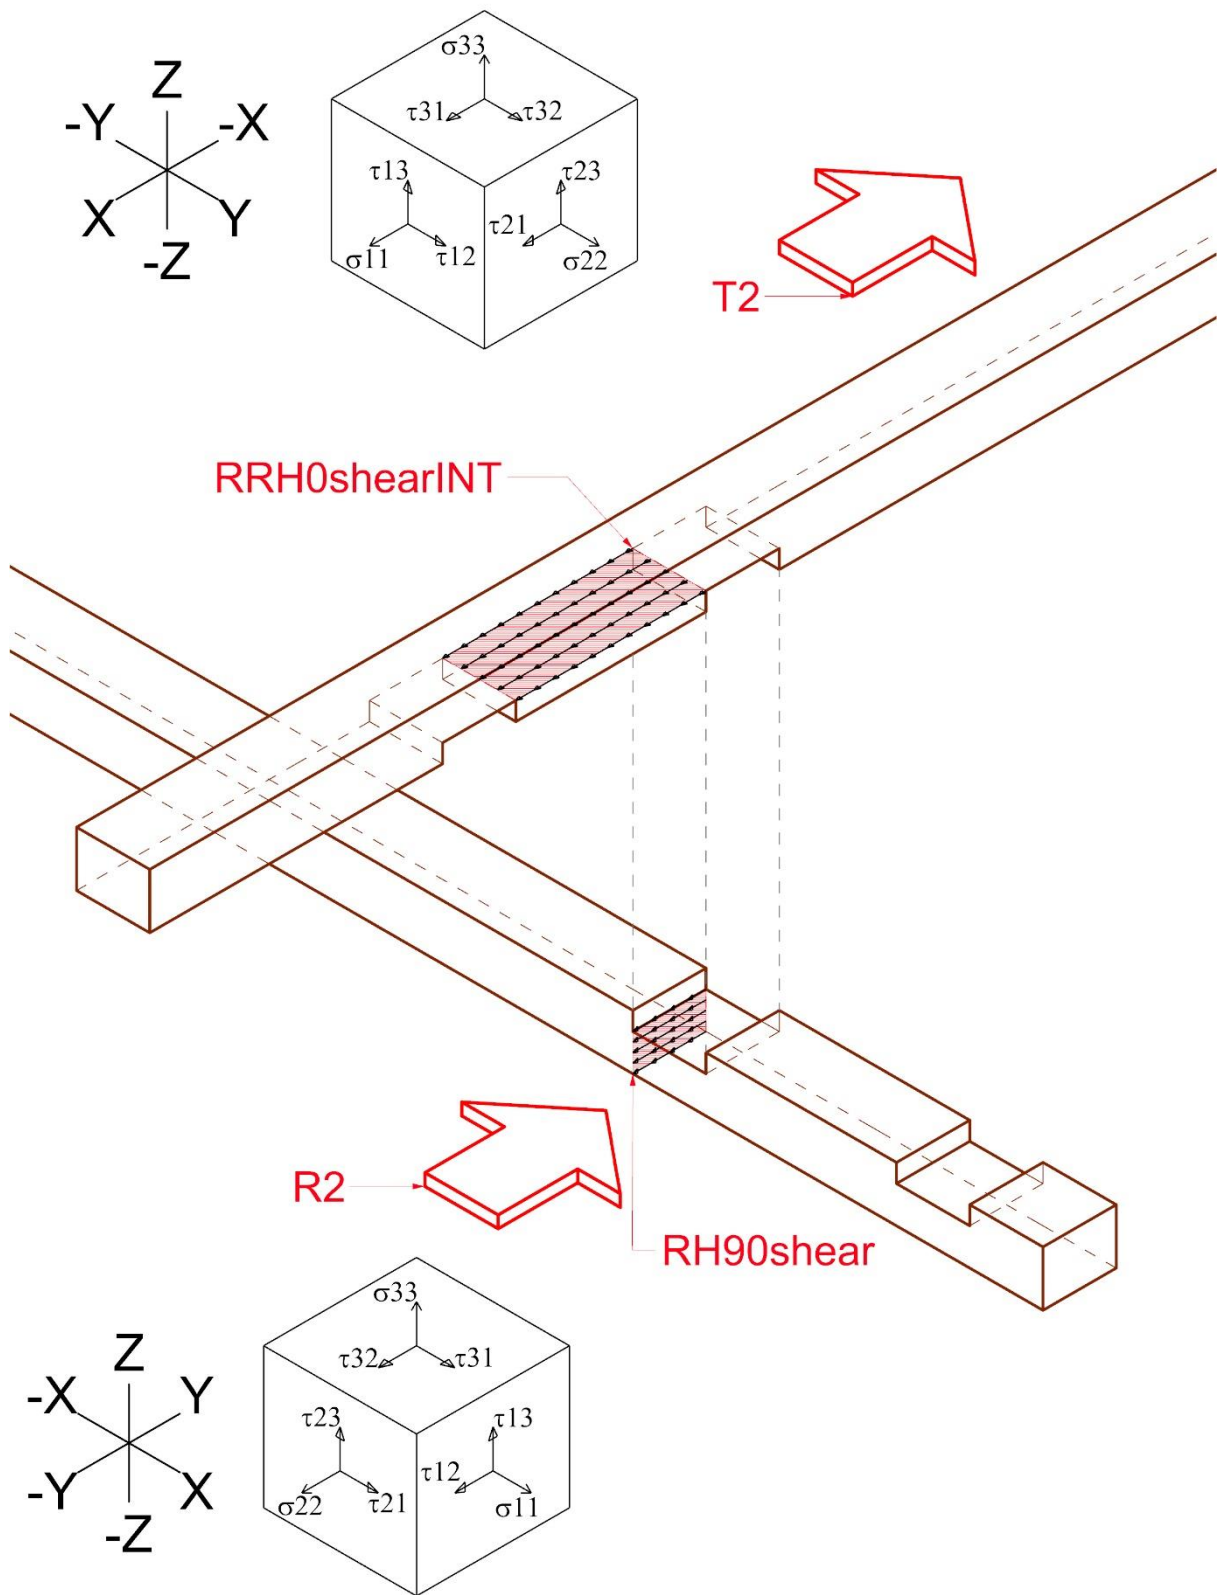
Roof Rafter Head Tangential stresses: Crossing rafters T2-R2
